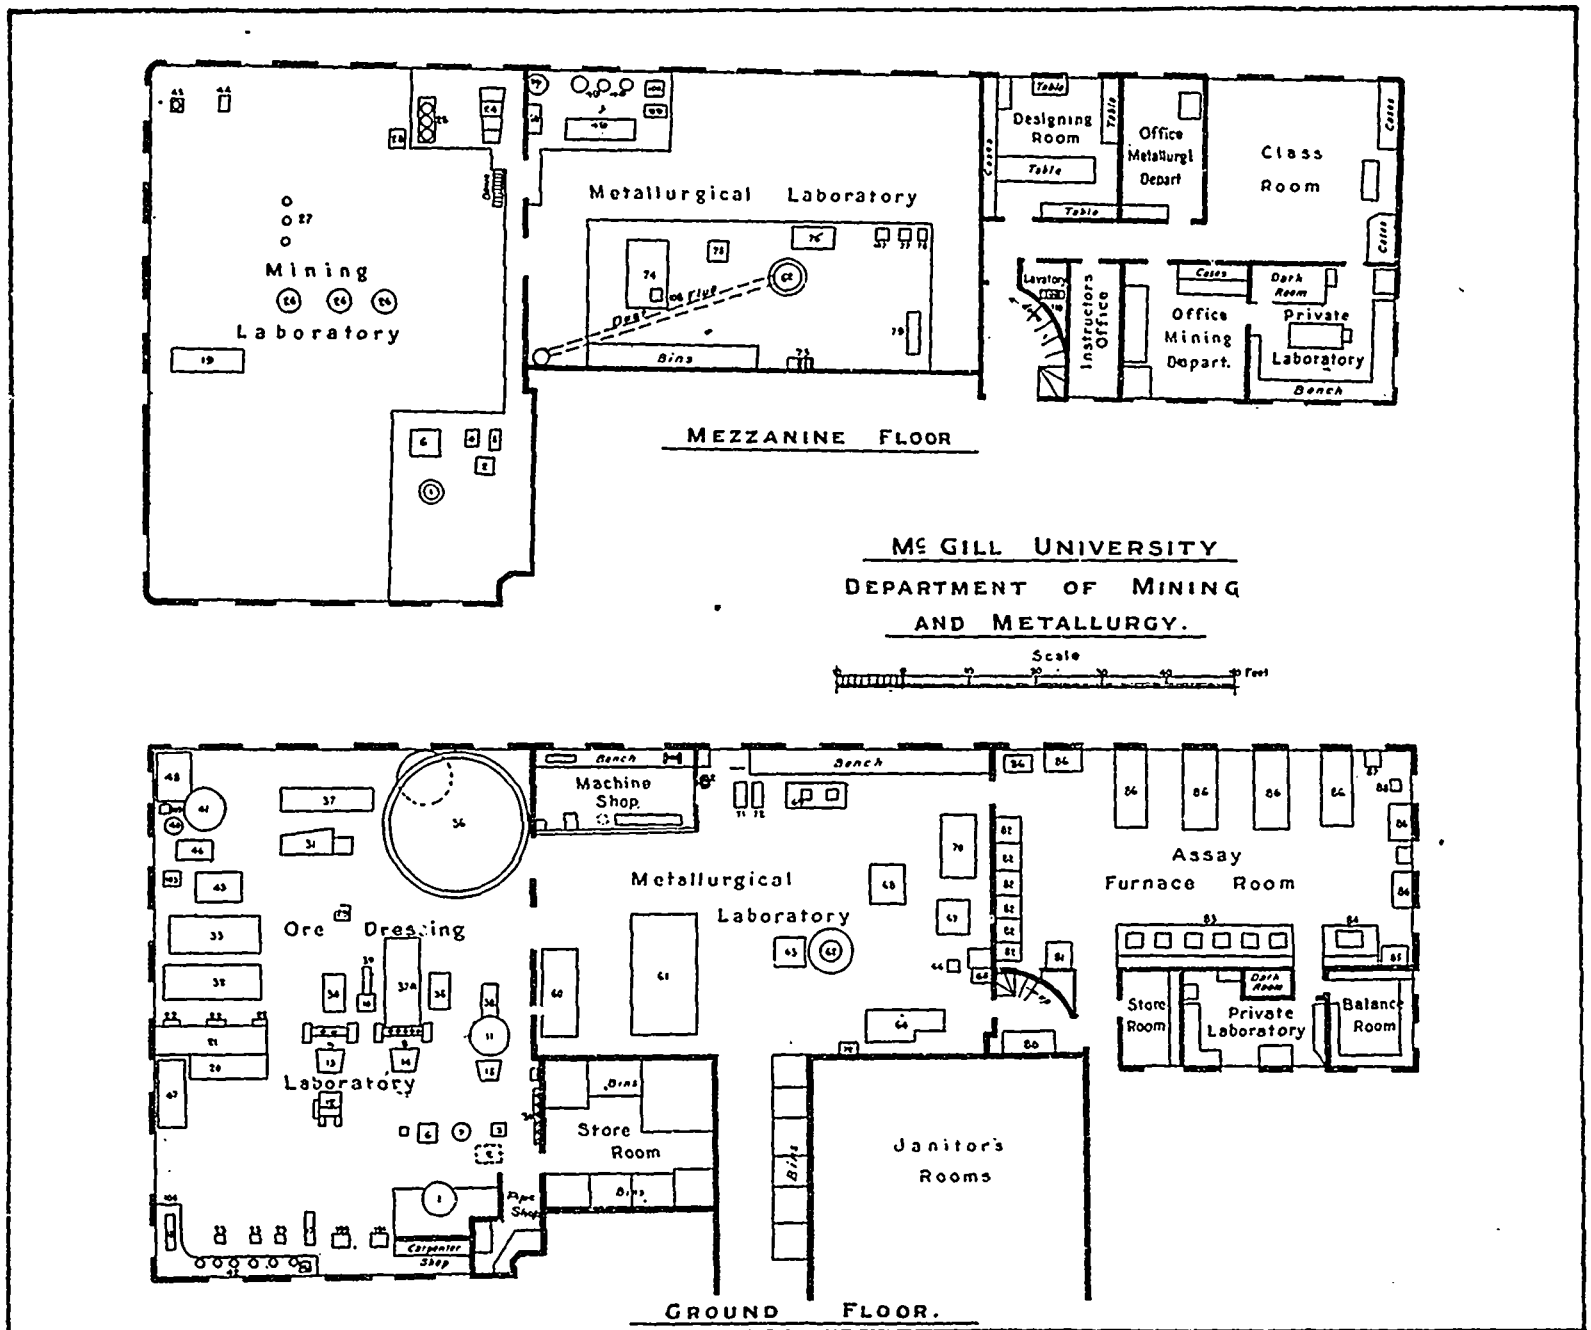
FLOOR PLANS OF DEPARTMENT OF MINING AND METALLURGY, MCGILL UNIVERSITY.
